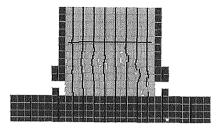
Damage to the bottom part of jacketed RC bridge pier
